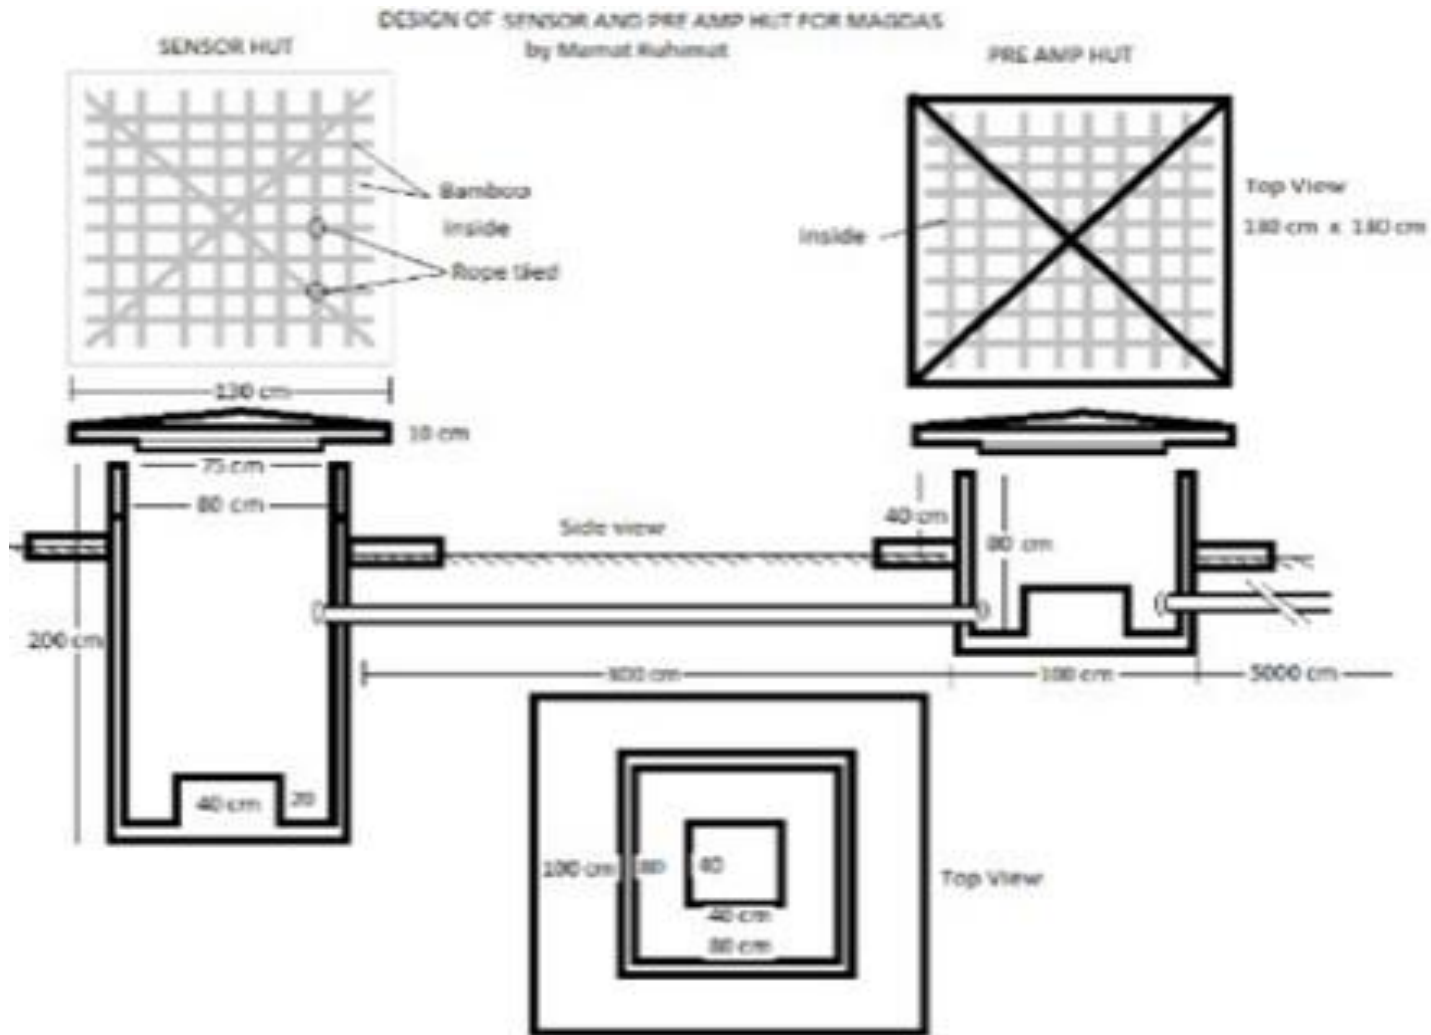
a : Design plan of construction of Sensor hut and Pre-amp hut
